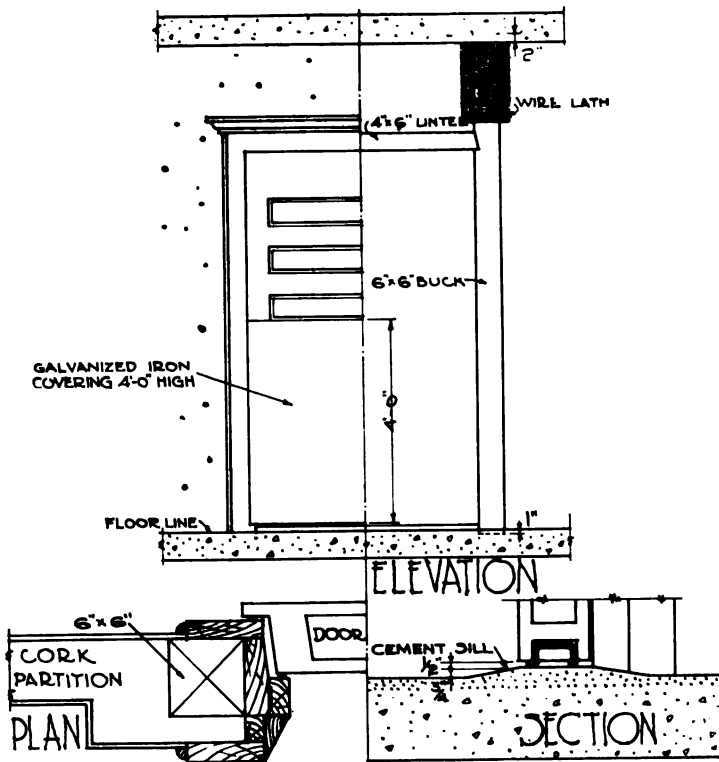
REFRIGERATOR DOOR IN CORK BOARD PARTITION.
